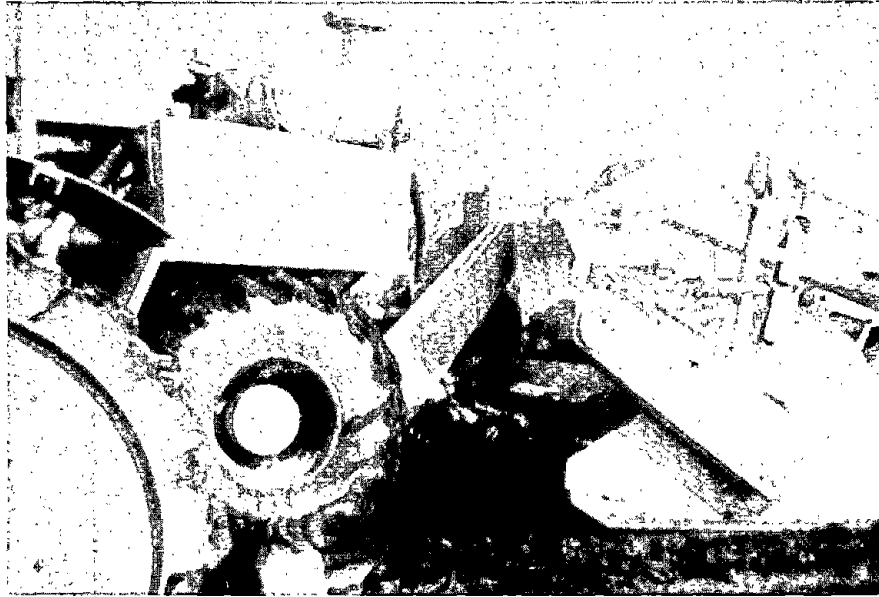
Mixing fly ash, lime, and soil with single-pass mixer-pulverizer on I-29.
